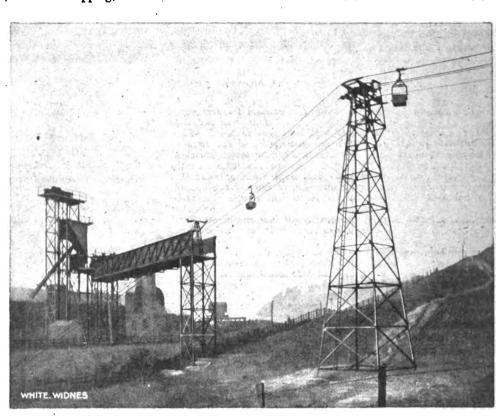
BRIDGE OVER RAILWAY, AND AUTOMATIC ANGLE STANDARD.
